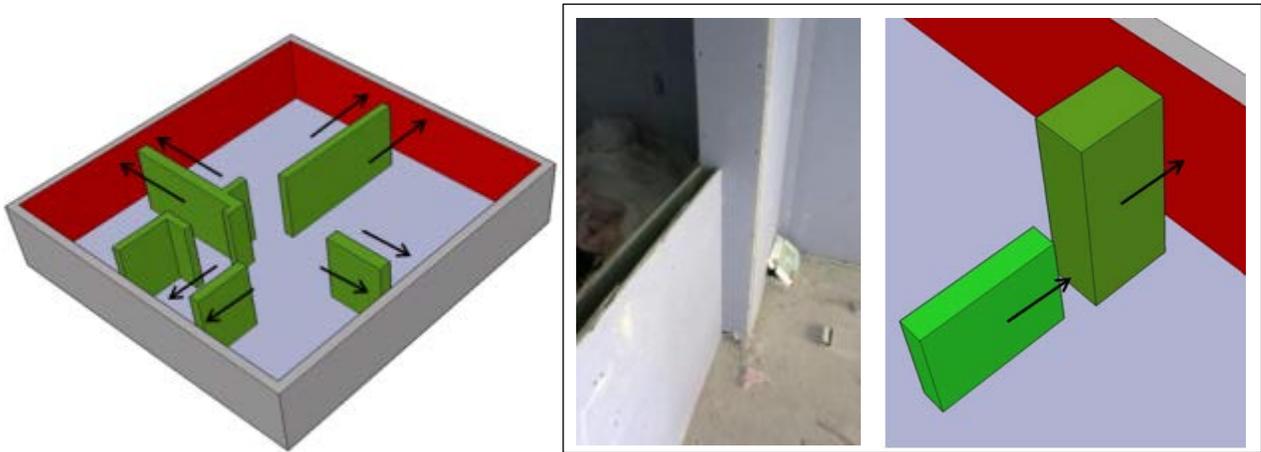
Layered drywall approach. Red surfaces indicate continuous drywall that forms the apartment air barrier. Green shapes indicate interior partitions.
